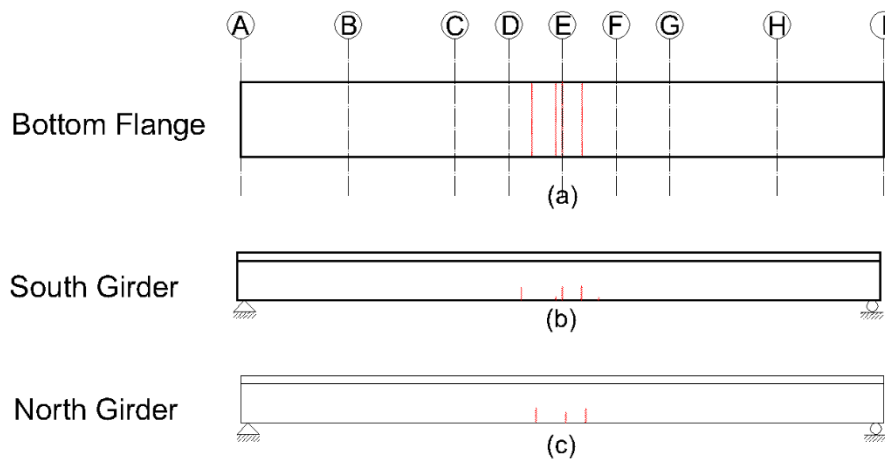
Crack distribution in test 02 at (a) bottom flange, (b) South girder, (c) North girder
